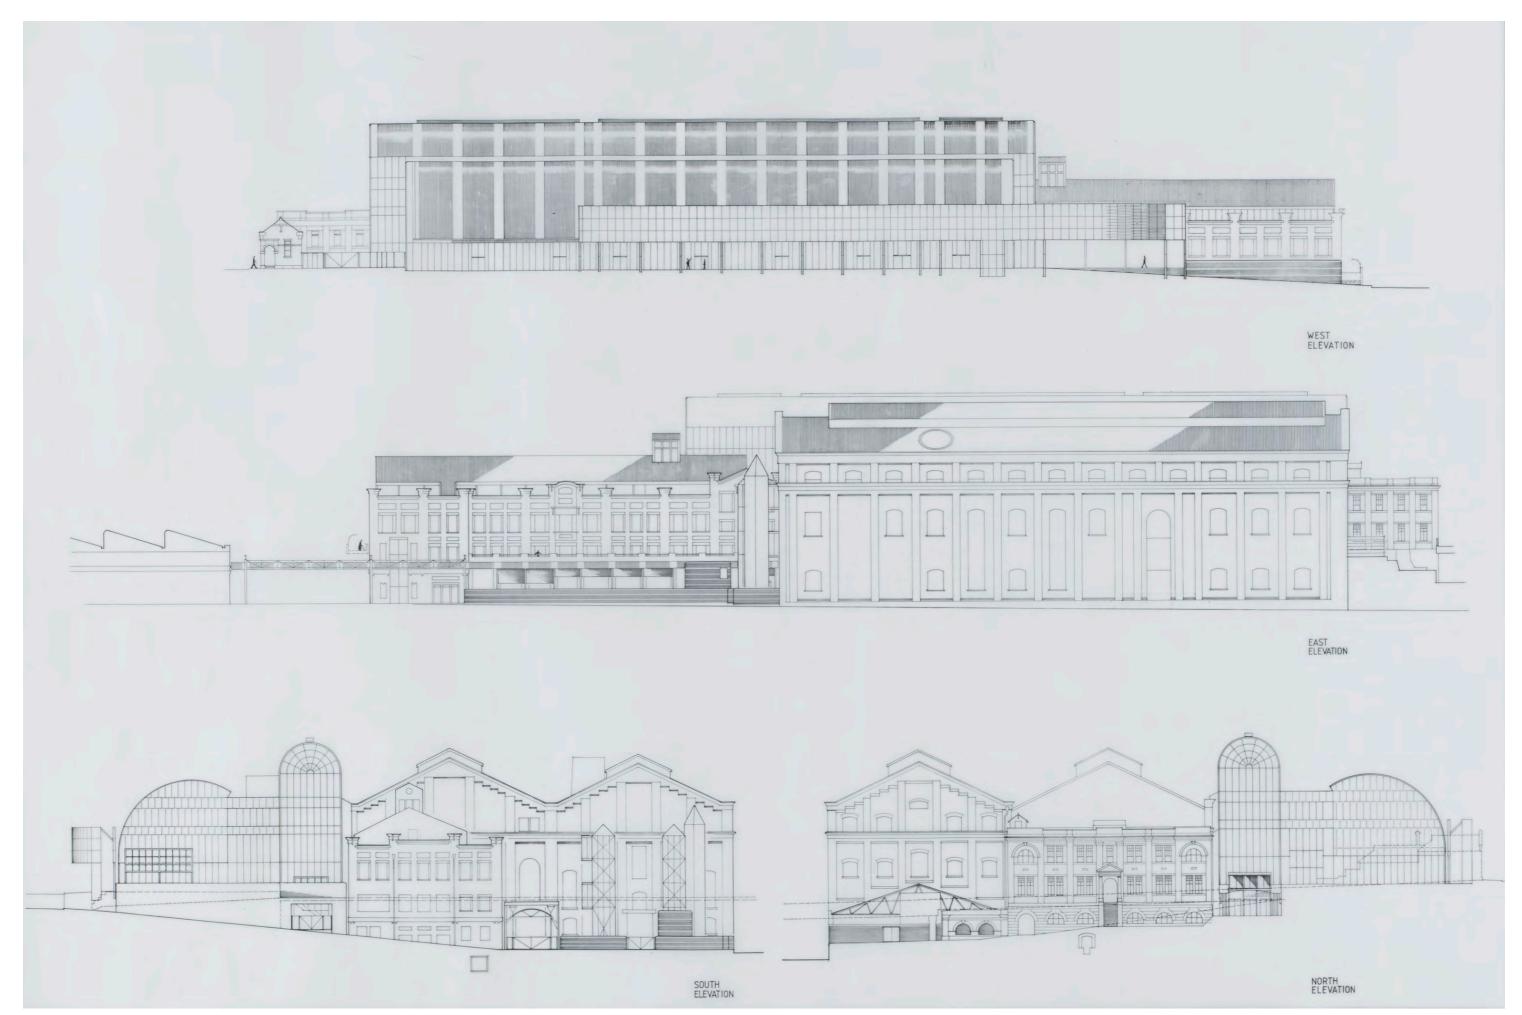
2008/88/1 Architectural drawings (14), Powerhouse Museum, tracing paper / microfilm / ink, designed by Lionel Glendenning, made and used by New South Wales Department of Public Works, Sydney, New South Wales, Australia, 1987
